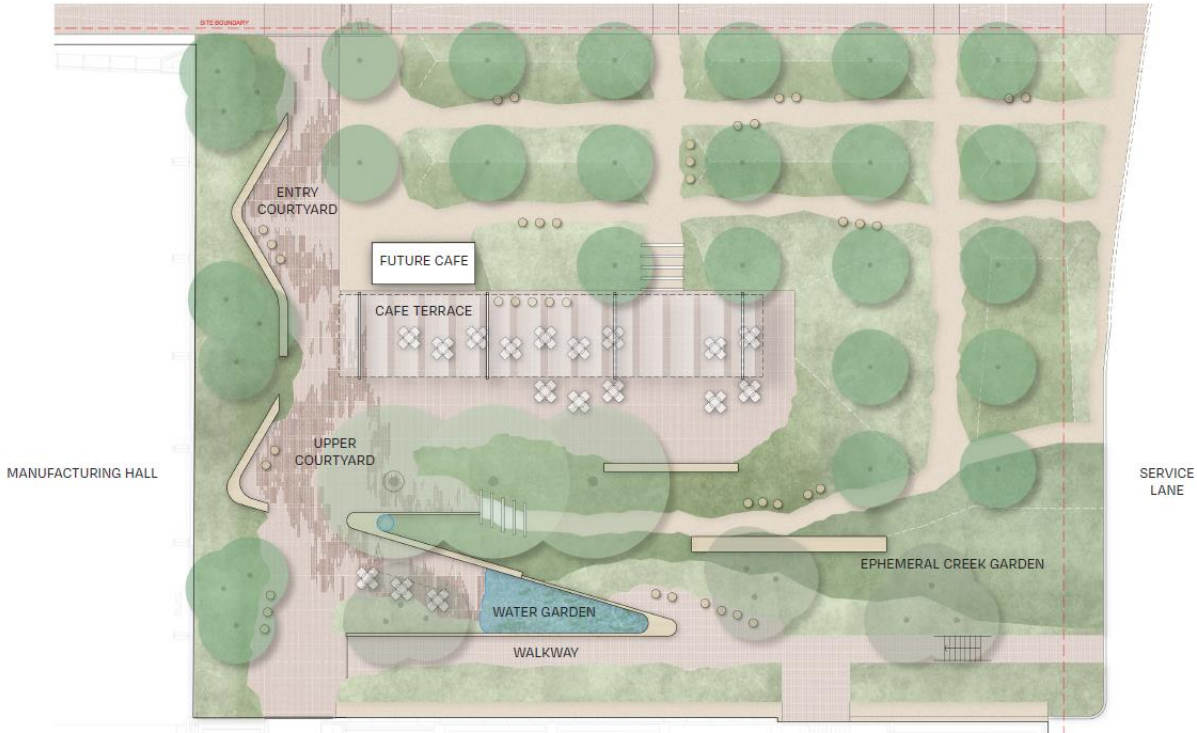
AMRF2 landscape design as proposed (Stage 1)
